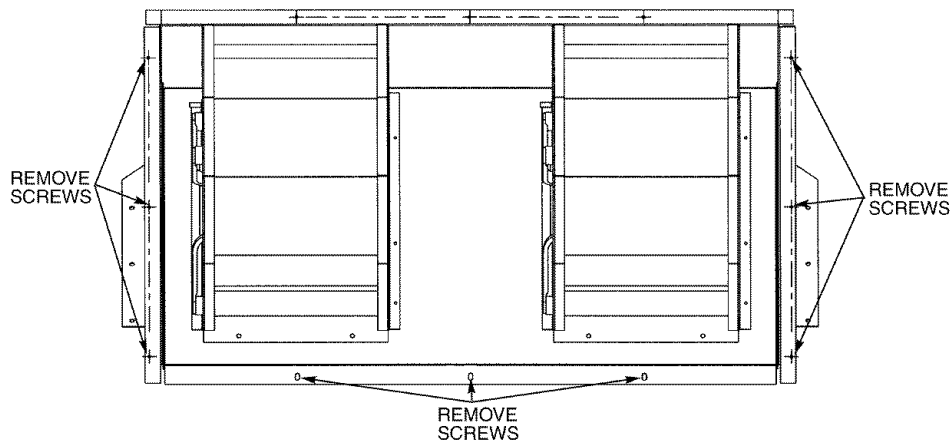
Power Exhaust or Barometric Relief Damper Mounting Details
